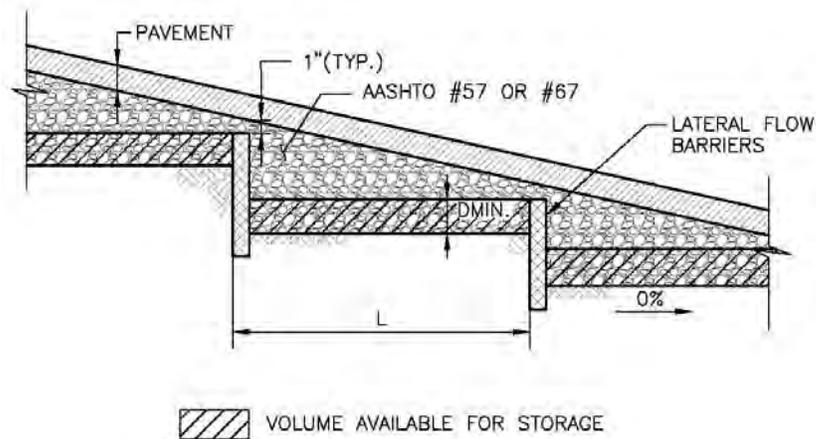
Permeable Pavement Profile, Stepped Installation
